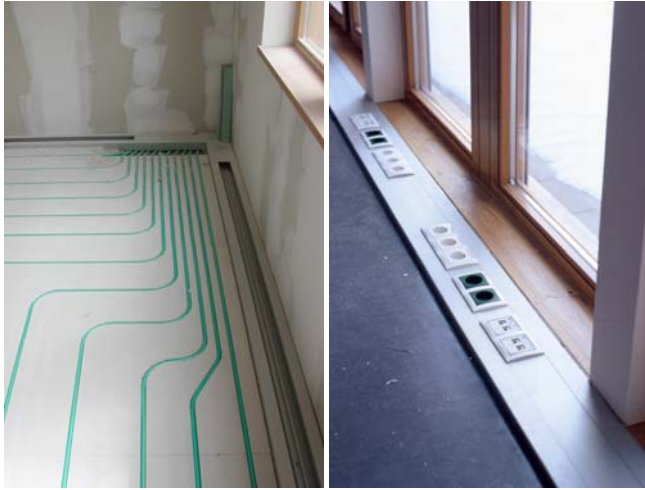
Installation of floor heating and the finished floor with installation frieze.
